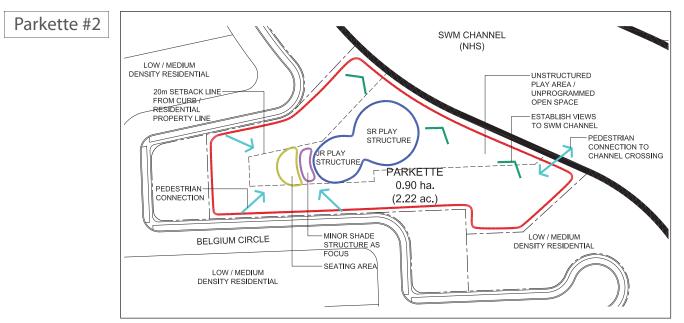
Parkette #2 conceptual facility fit diagram (detailed design of the park will be determined at the subdivision landscape drawing review stage).
